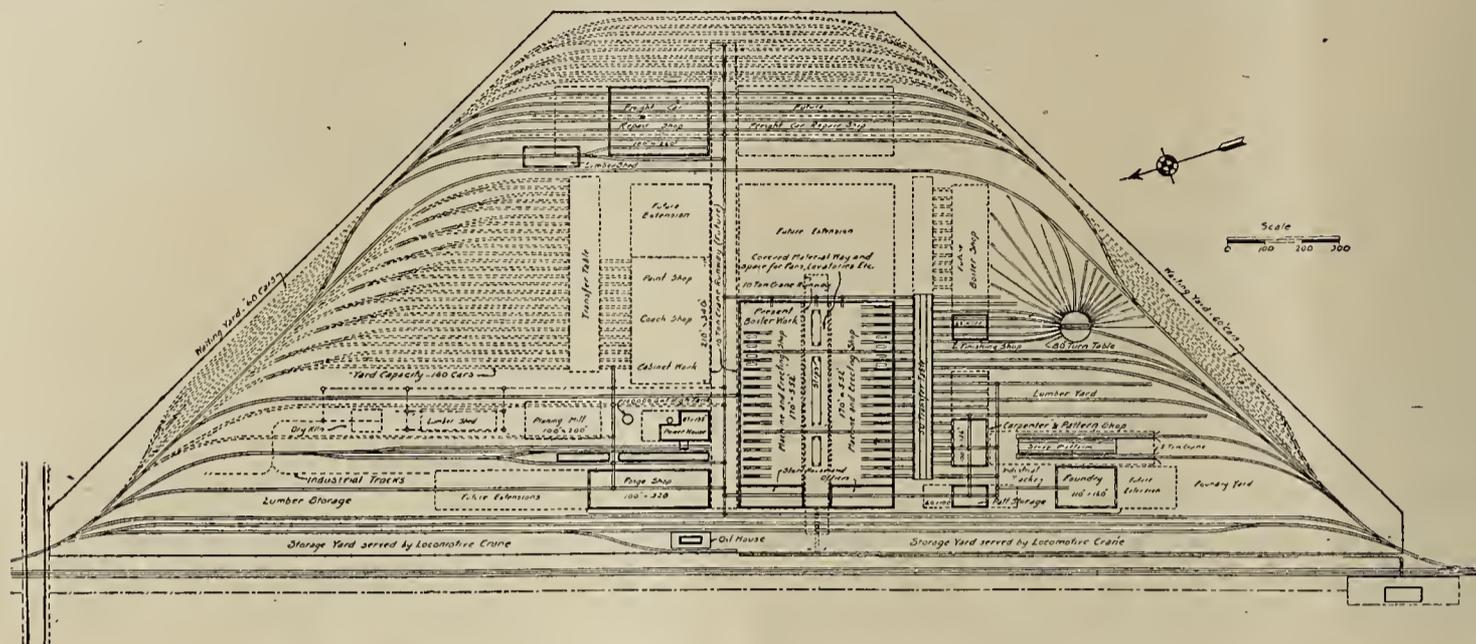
LAYOUT OF RAILWAY SHOP PLANT UNDER CONSTRUCTION.
